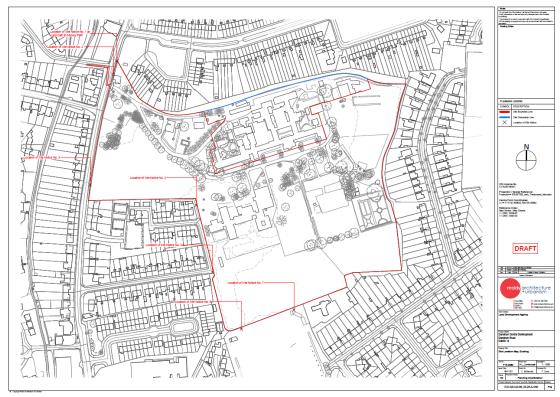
Extract of Proposed Site Layout Plan. Source: Dwg Ref. DCD-RAU-06-SW_XX-DR-A-0500, prepared by Reddy Architecture + Urbanism, 2022.
